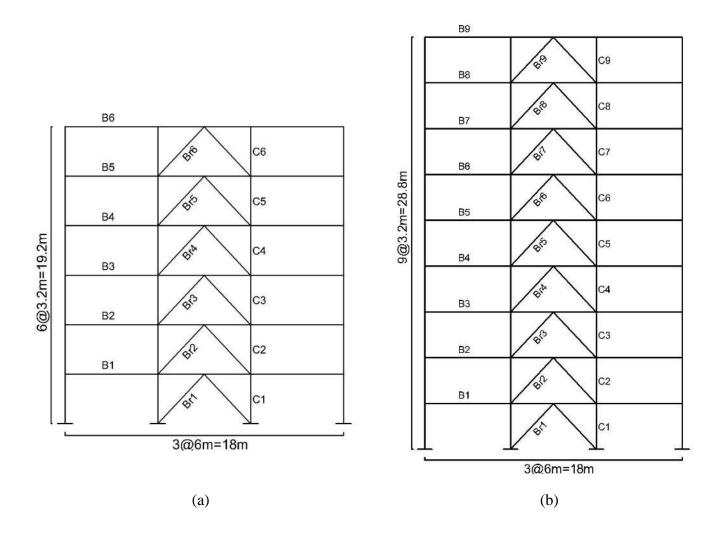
The elevation of PBPD frames a) 6 story b) 9 story
